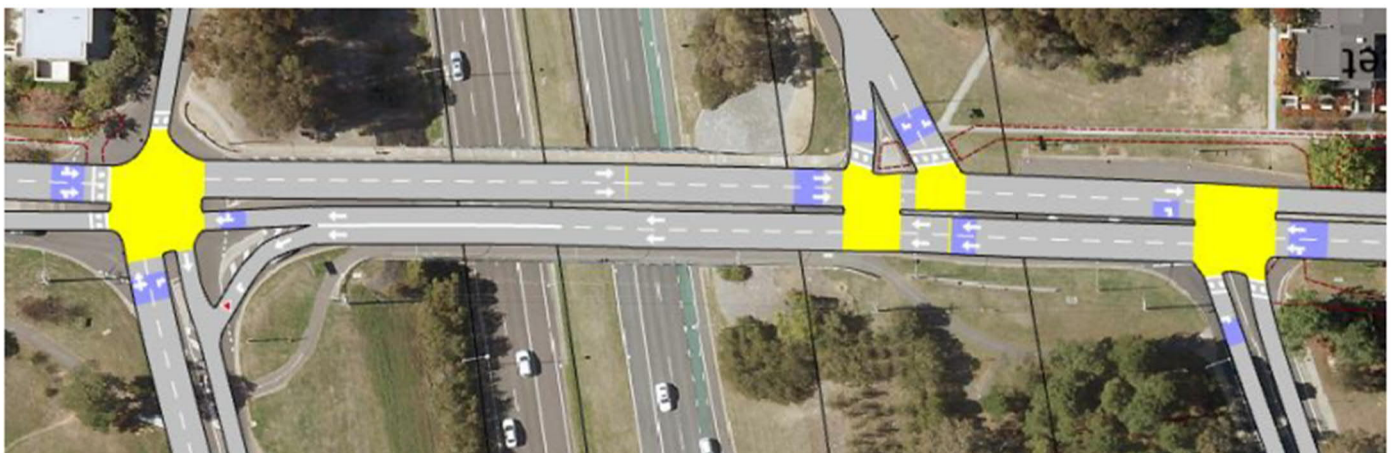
Kent Street Proposed Future Design from the Kent Street / Novar Street Report
